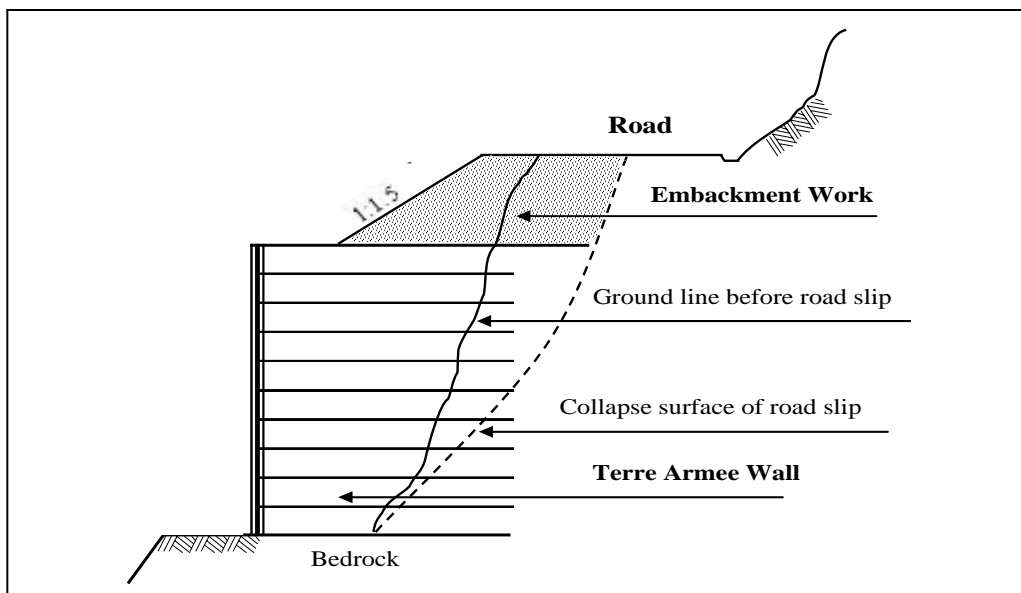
Example of a Road Slip Restored Using a Terre Armee Wall
